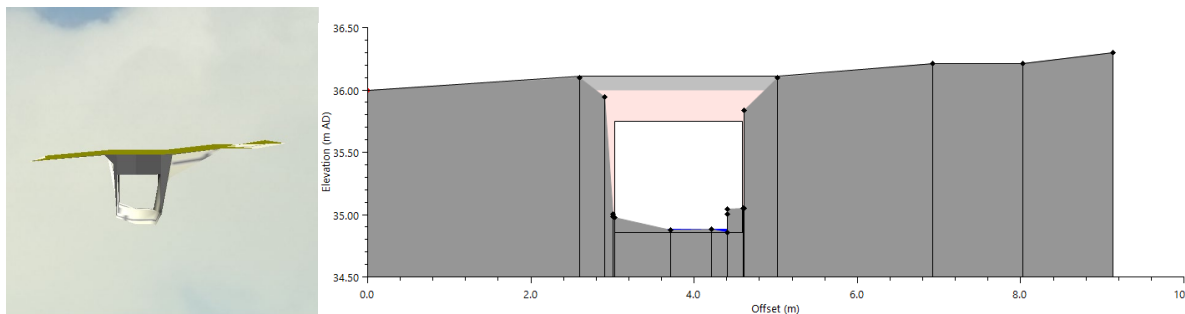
Example of 1D and 2D View of Bridge Sections
